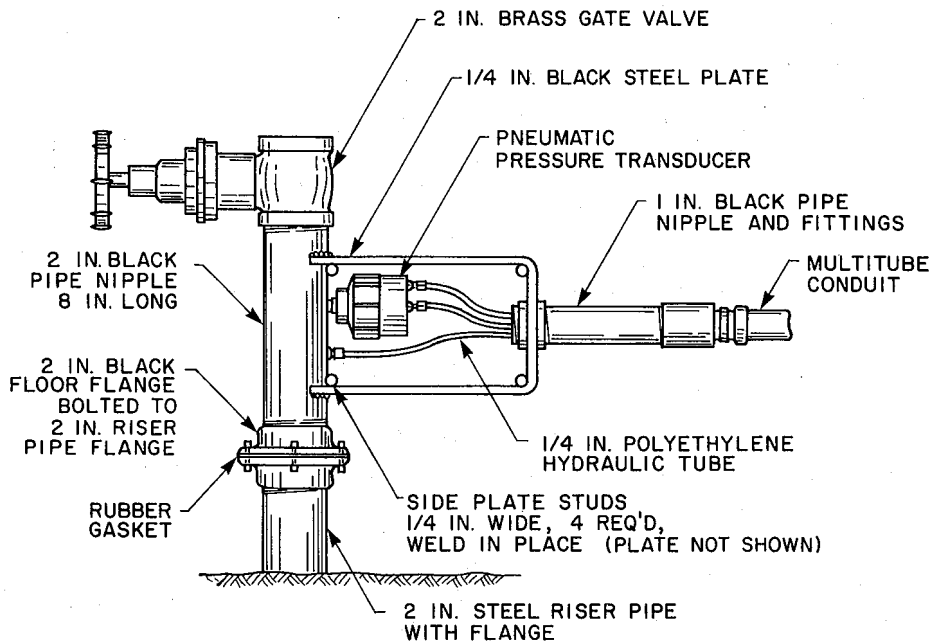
Detail of Dual-Sensing Piezometer Head
